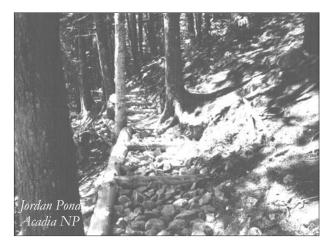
Log cribbing steps before receiving final top coat of gravel. The crushed rock that fills the crib facilitates trail drainage.
